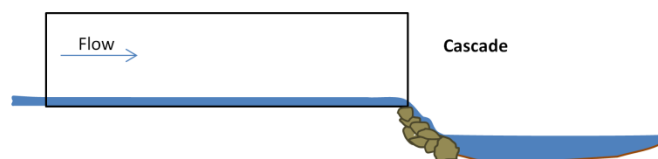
Diagram depicting a culvert with a cascade at the outlet. (Image credit: NAACC)
